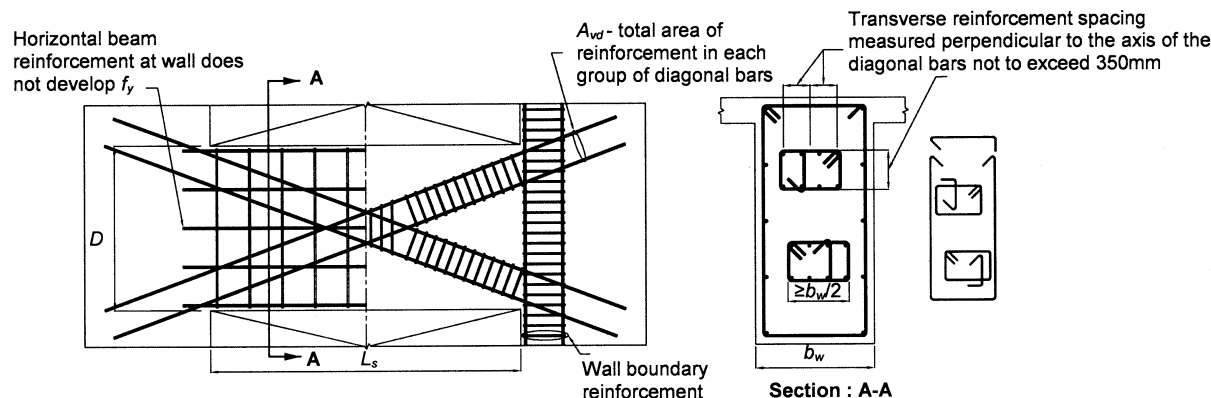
COUPLING BEAMS WITH DIAGONAL REINFORCEMENT
